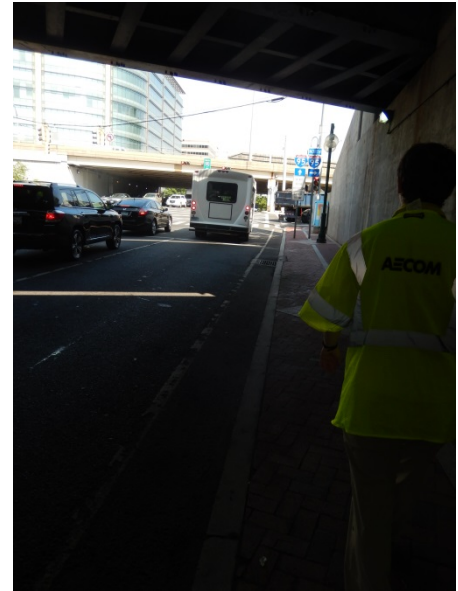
Lack of Lighting Under the Metro north Rail Road Bridge
